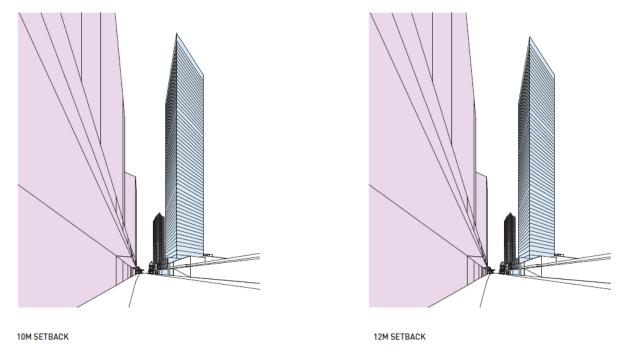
10m/12m setback of tower when viewed from Church Street (Source: Urban Design Report – PTW)
